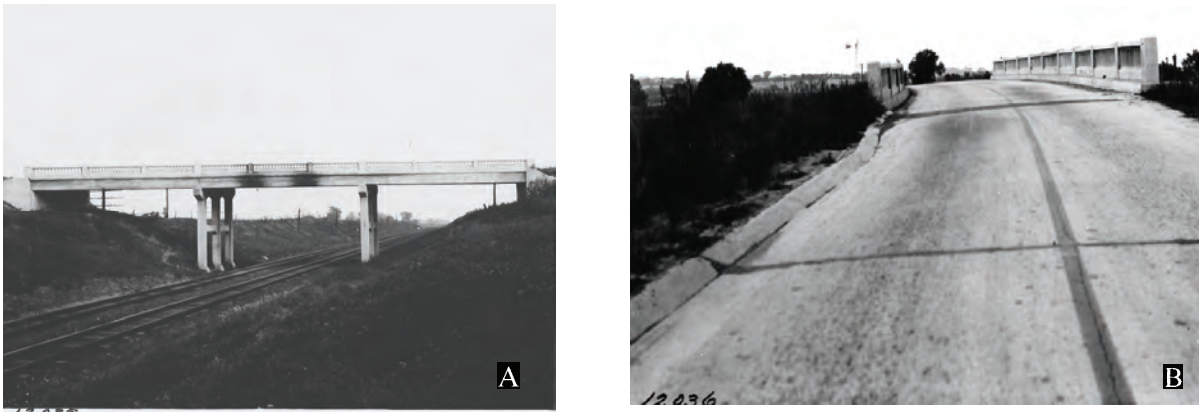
A & B. Views of ca. 1928 concrete bridge over C. B. & Q. tracks on the western edge of Mount Pleasant. Note black centerline (photos #12,035 and #12,036 from Iowa DOT Library–Paving Folder).
